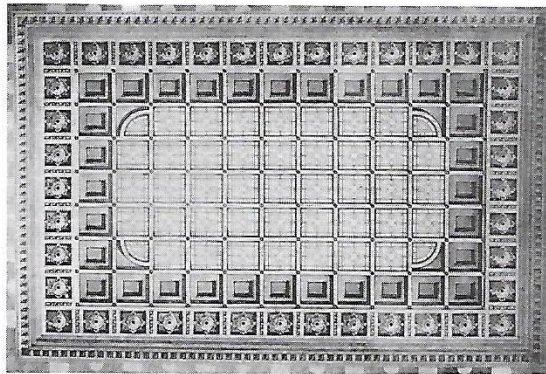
Plan of ceiling dated March 28, 1856. The visible ceiling was of cast iron elements cast in New York and stained glass from Philadelphia. Drawing dated March 28, 1856.
